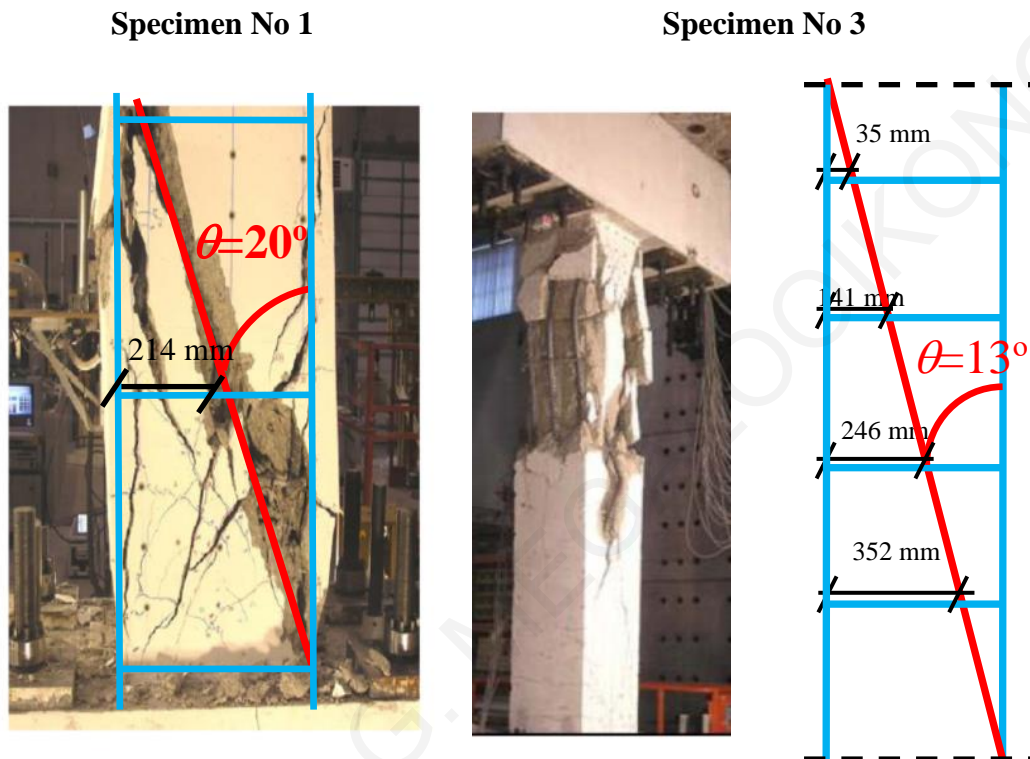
Truss geometry for typical lightly reinforced concrete columns (Experiments by Matamoros and Woods 2010).
